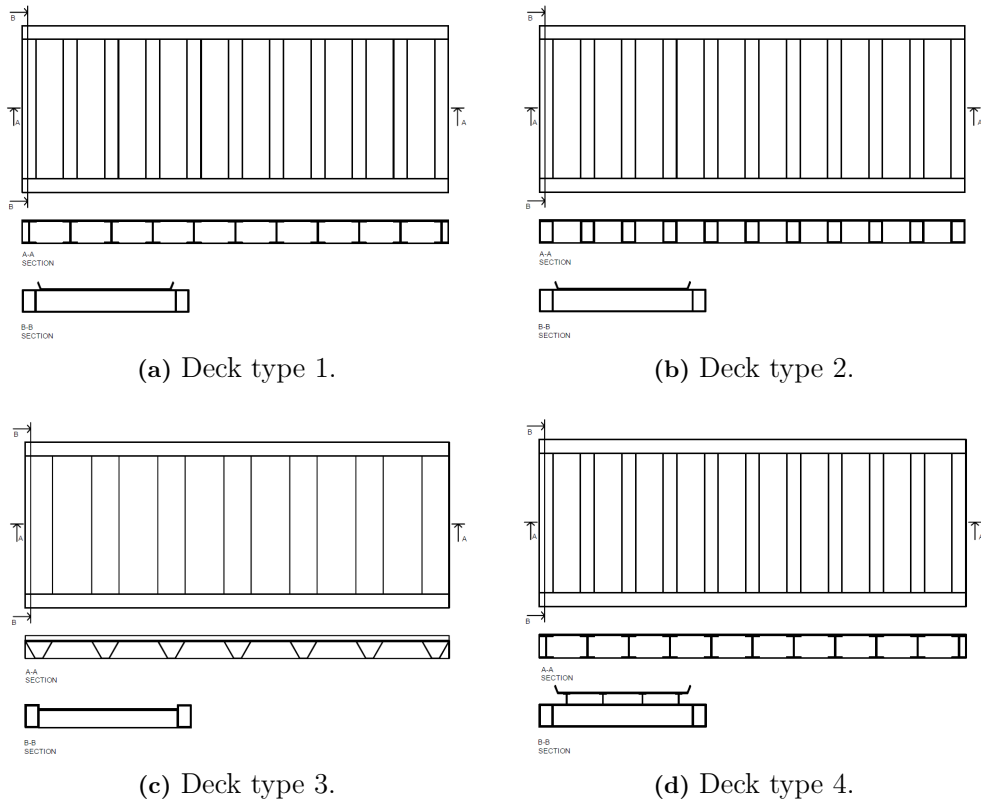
Plan, elevation and sectional view for the different deck types.
